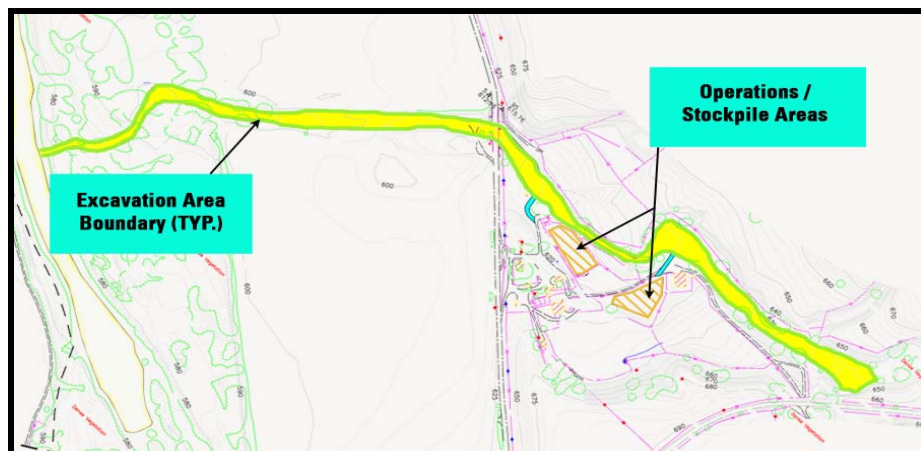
Vineyard Creek Excavation Area for previously proposed project.
